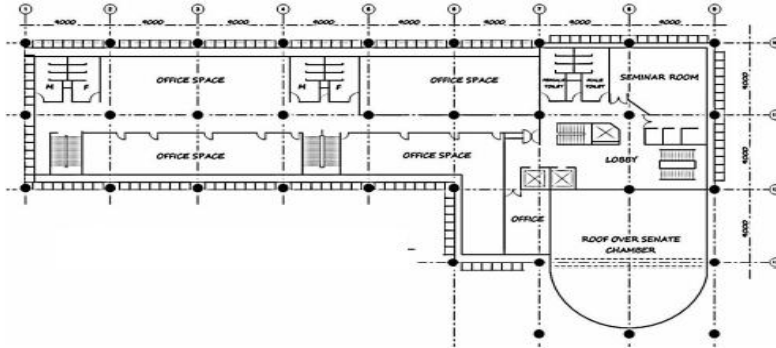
Typical second and third floor plan of Unilag Senate House (Source – Author’s field work)
